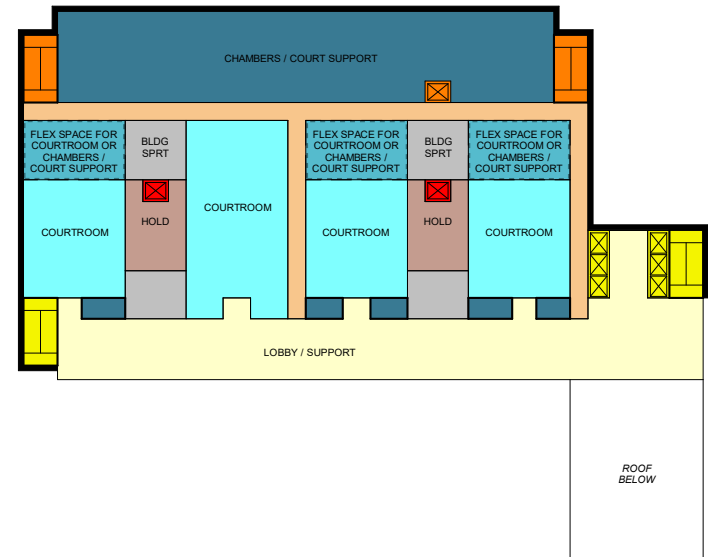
Option 5 - Compact Layout with 4 courtrooms on a typical floor
